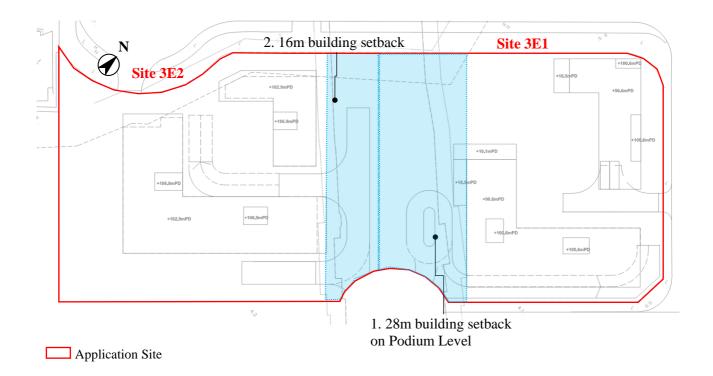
Layout plan of Site 3E1 and 3E2 of Proposed Scheme
